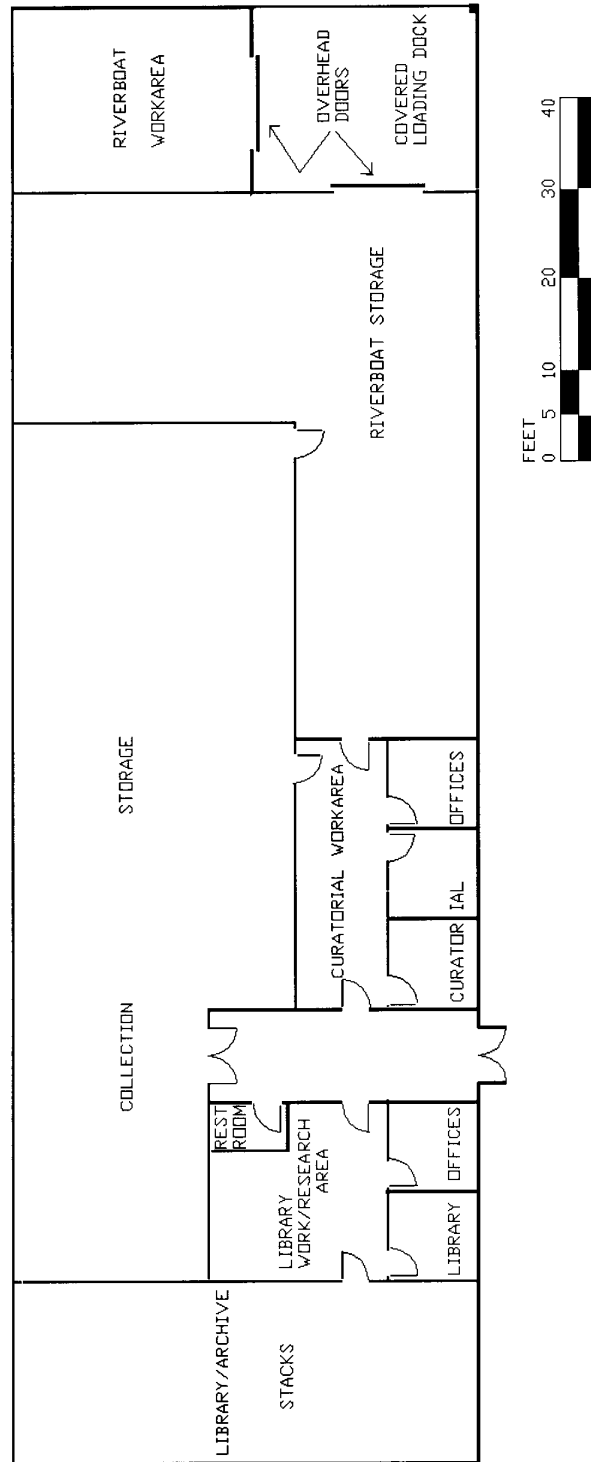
Sample General Floor Plan of a Museum Collection and Library
